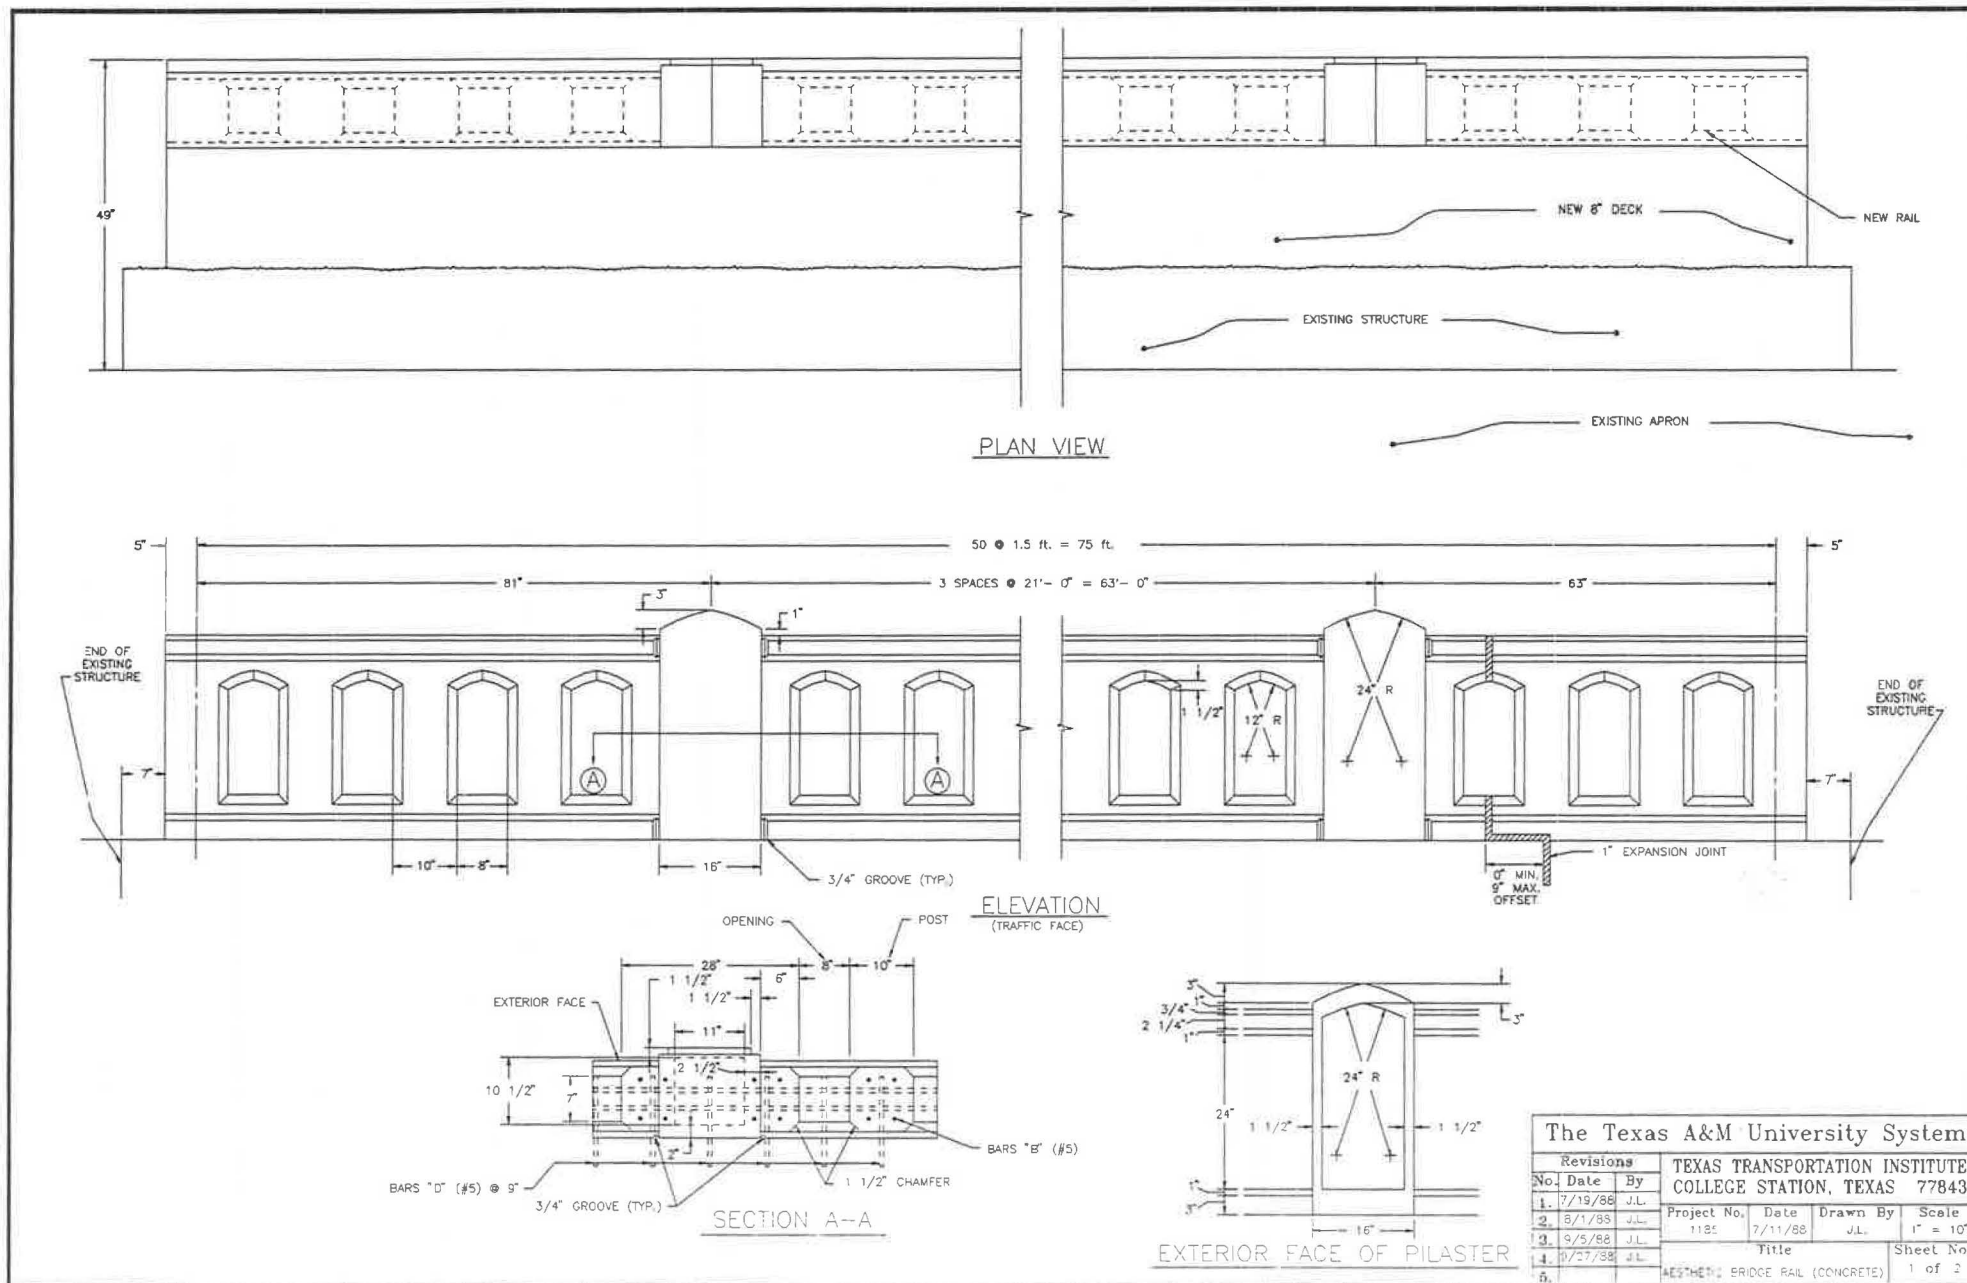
Texas Type T411 bridge rail—plan and elevation.
